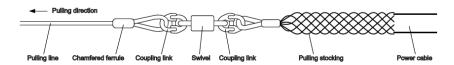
Cable End Connection to Pull-in Rigging (typical from [6])
